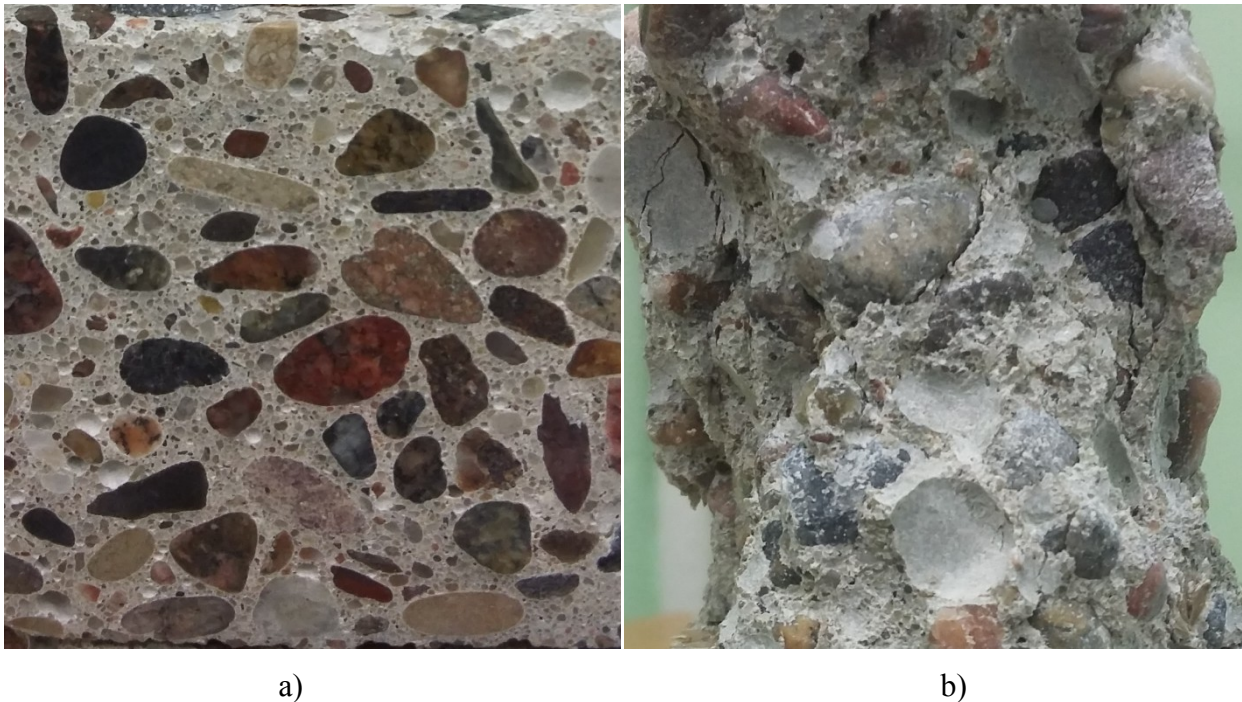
View on face side of specimen '1' a) before test and b) after failure
